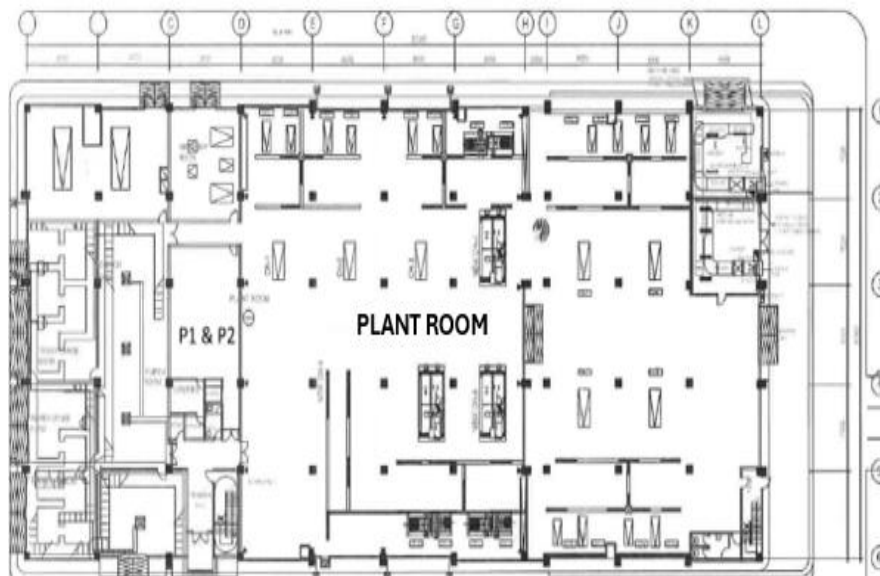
The layout plan of the chiller plant at the MEP Building, UNIMAS.
